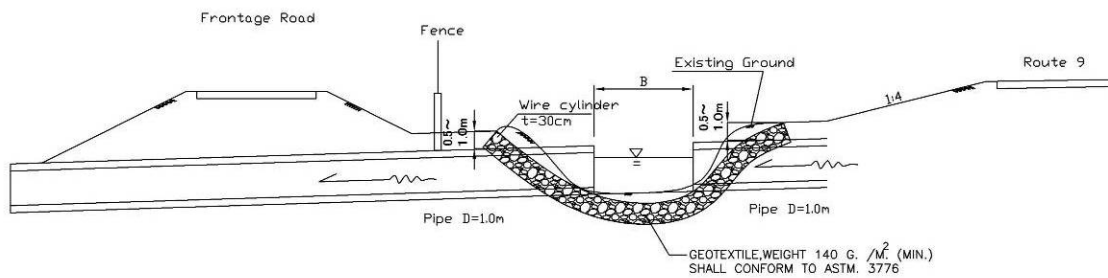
Protection Work at Inlet/Outlet of Drainage Facilities
